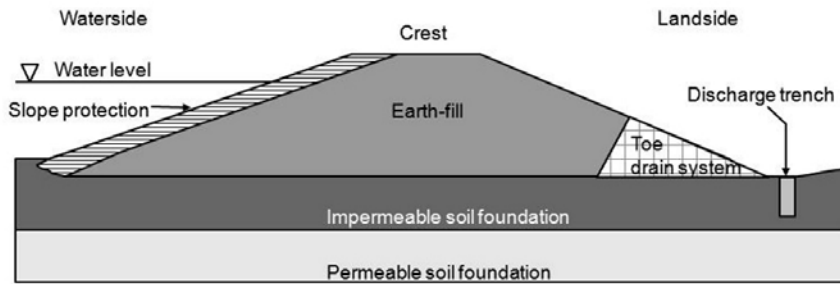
Homogeneous levee with slope protection on thin impermeable soil foundation
